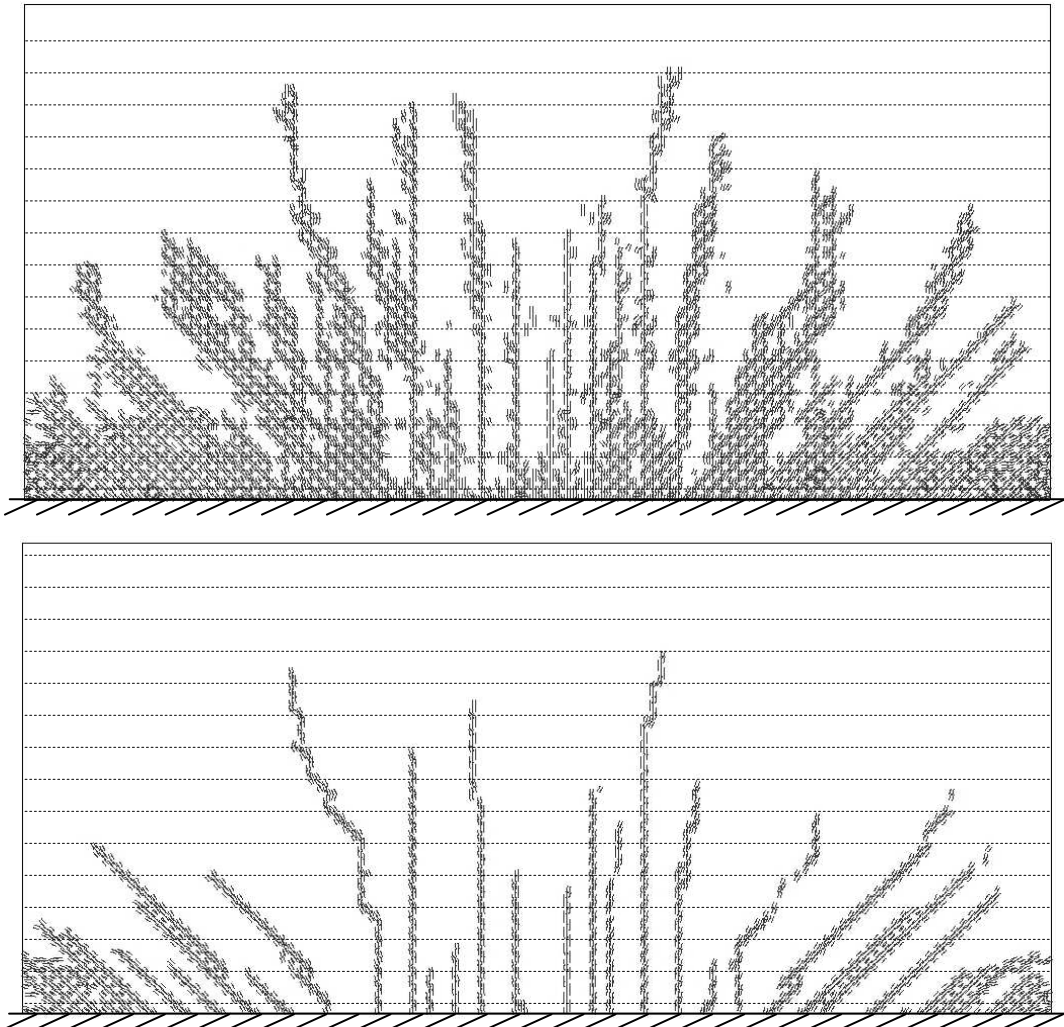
Crack pattern for 0 (top figure) and 100 % (bottom figure) open cracks at  $\varepsilon_{cs} = 1.00 \text{ ‰}$  for wall with  $h = 2.9 \text{ m}$  and cross-section 1 with fibre reinforced concrete.
